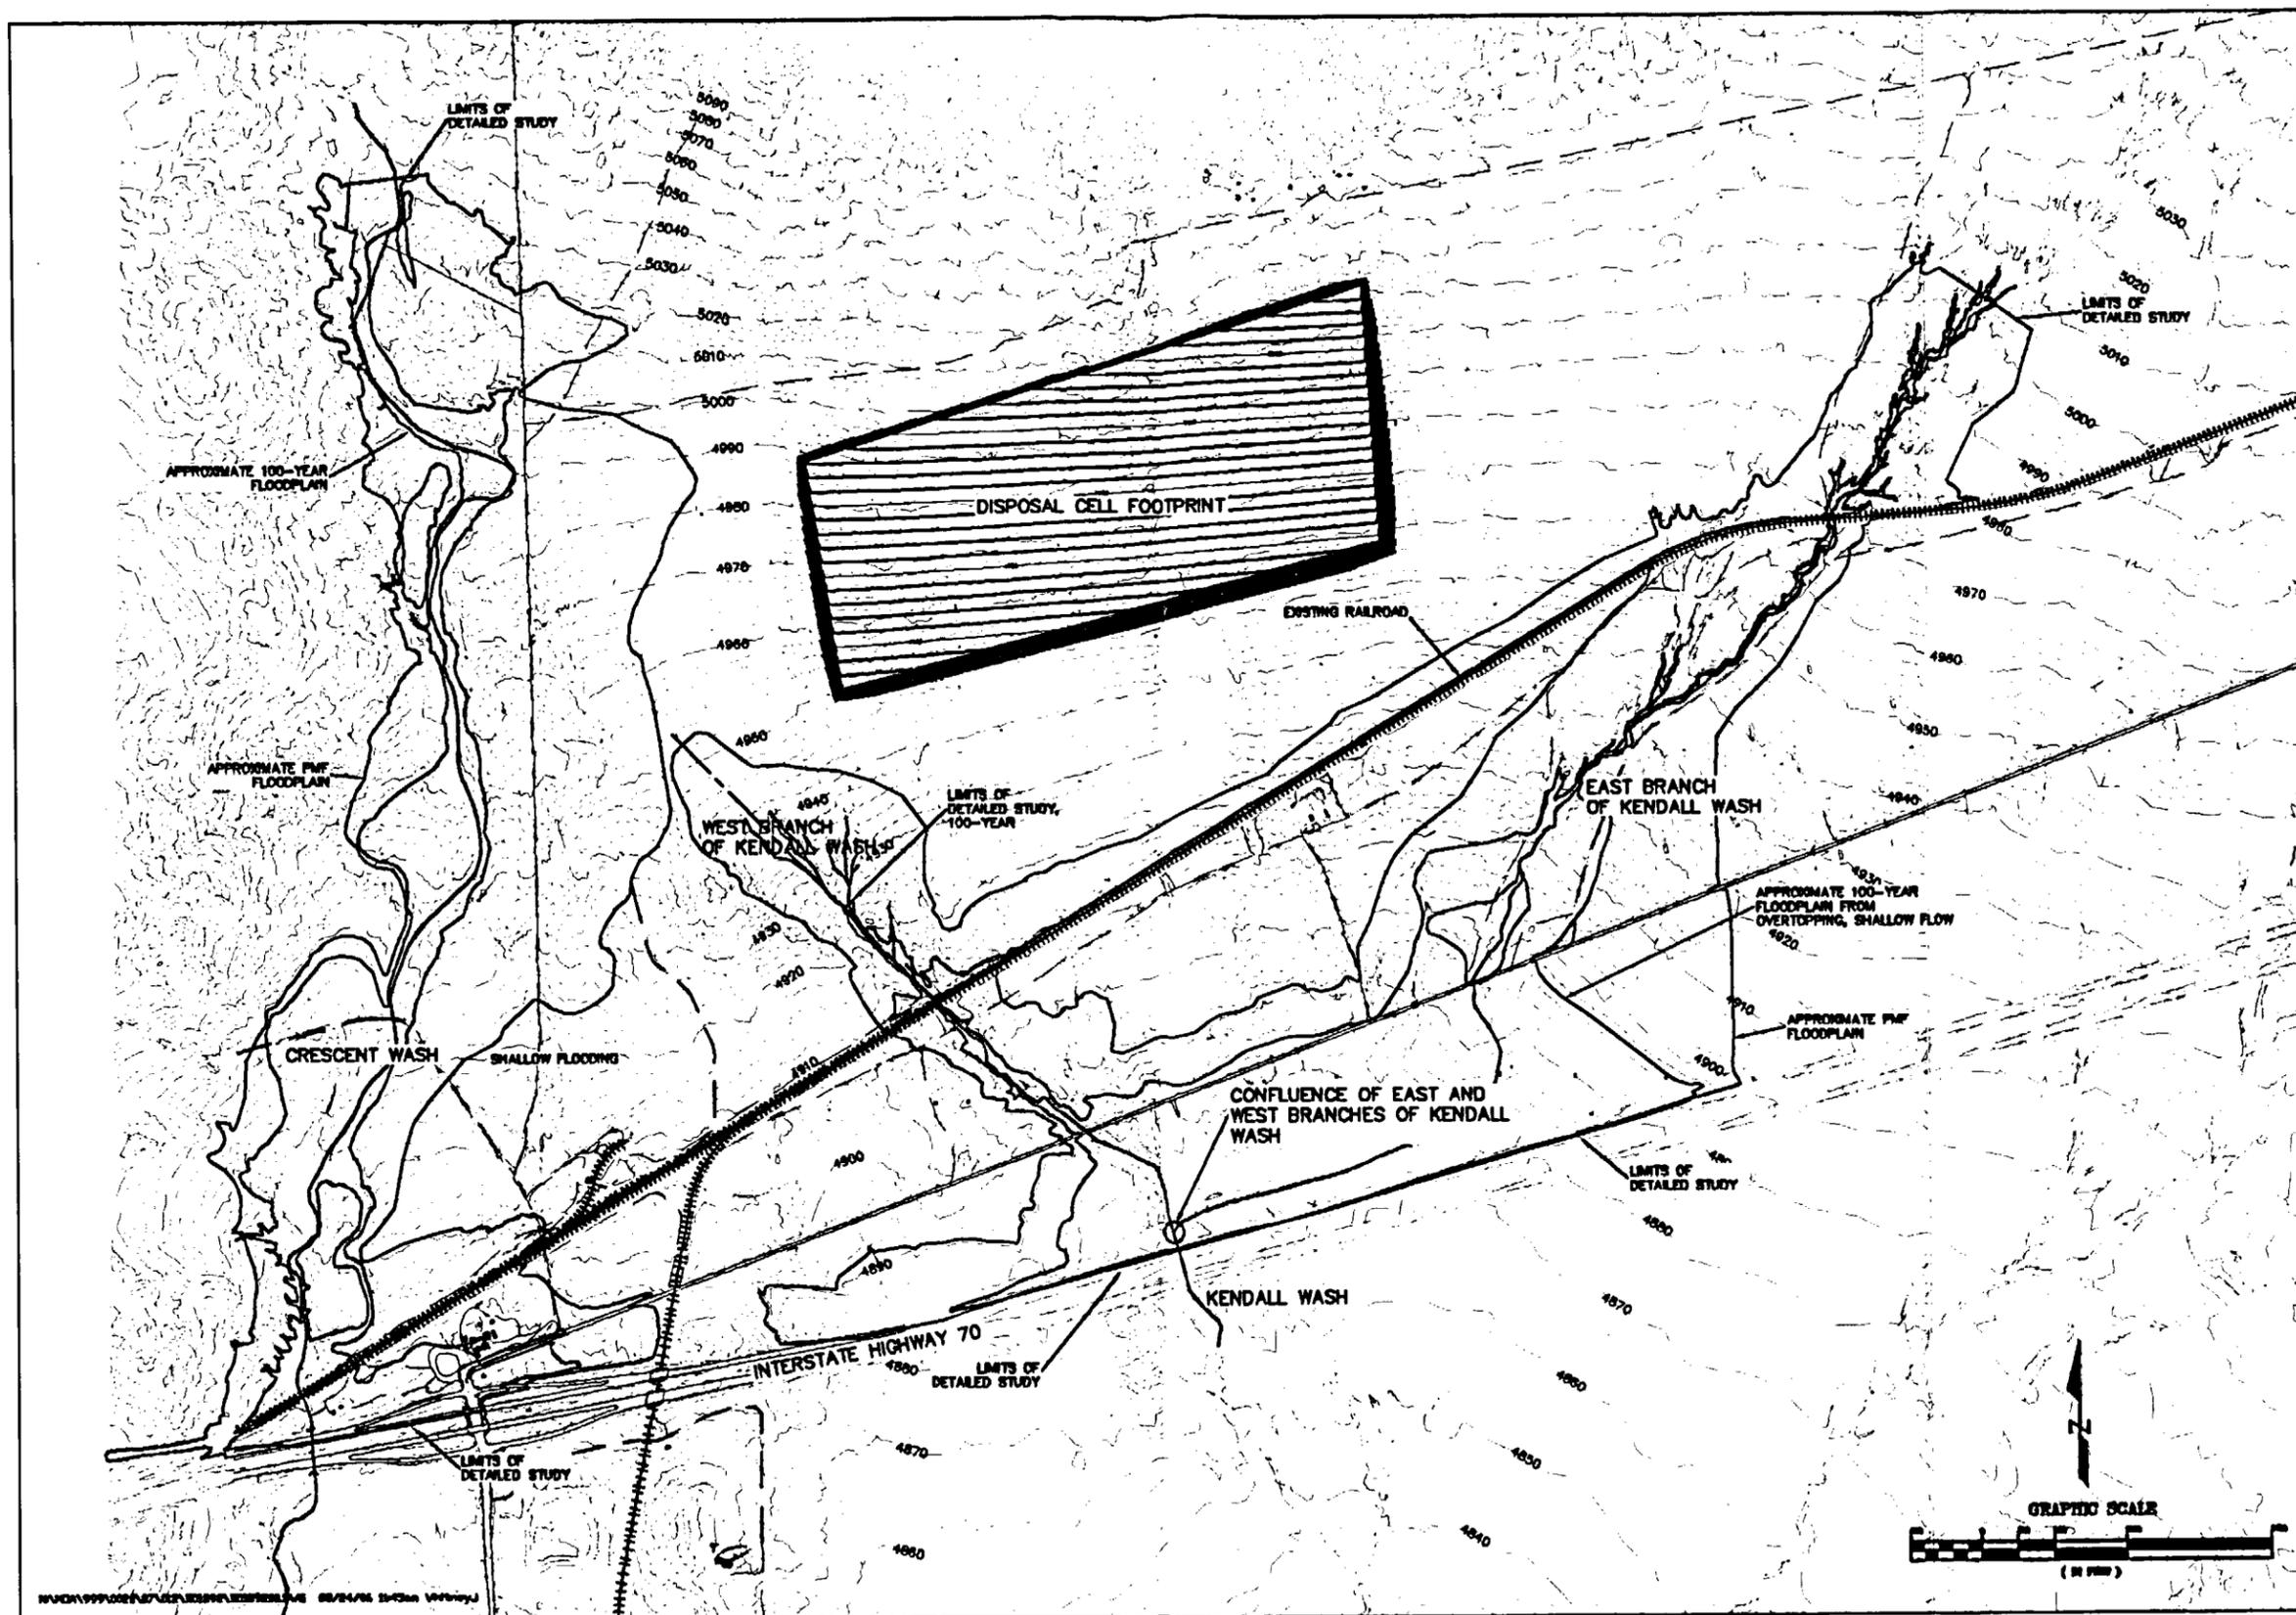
PMP and 100-Year Floodplain Delineations for the Crescent Junction Disposal Site
